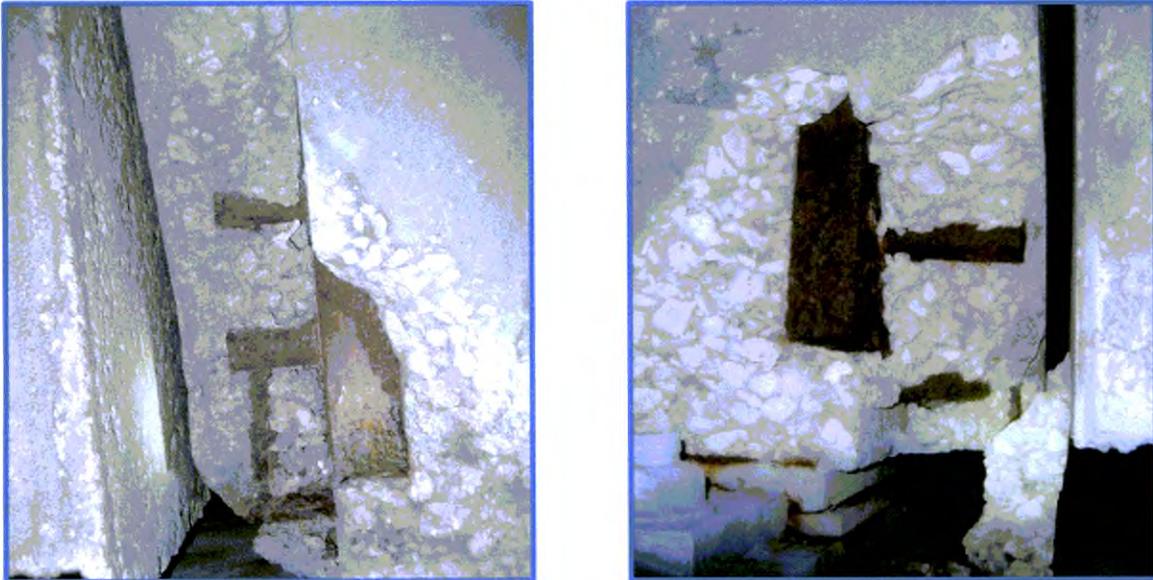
Typical examples of concrete damage and exposed post-tensioned components at the ends of girders.
